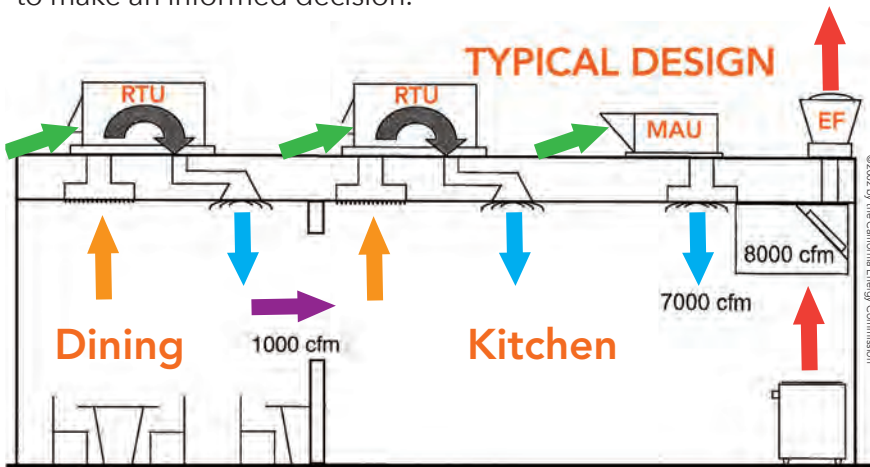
Typical HVAC equipment arrangement for a restaurant.
